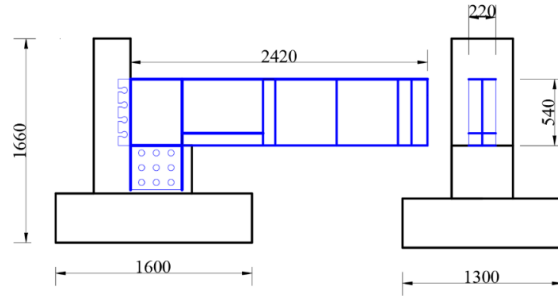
Dimensions of girder-abutment test [21] (Unit: mm).
